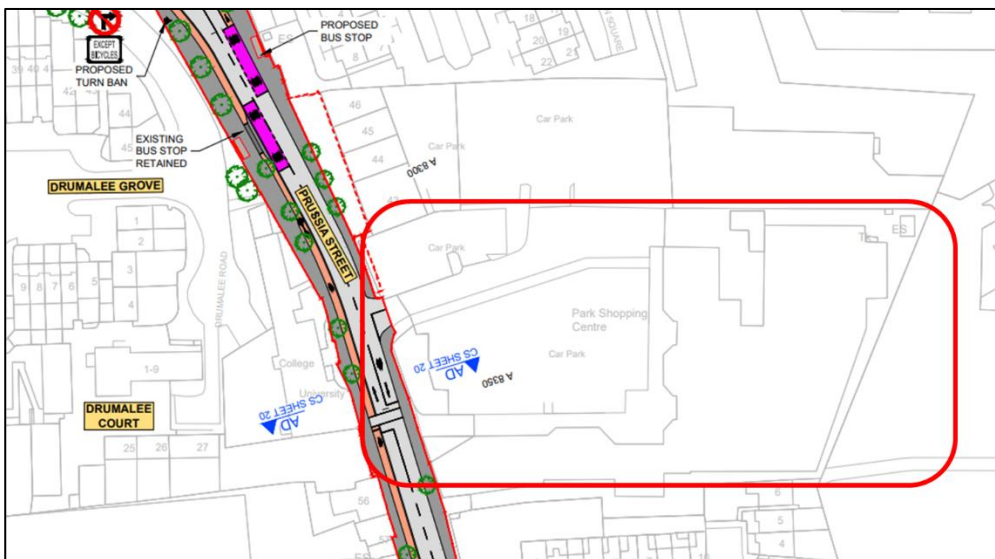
Proposed new Layout at Park Shopping Centre, Prussia Street
